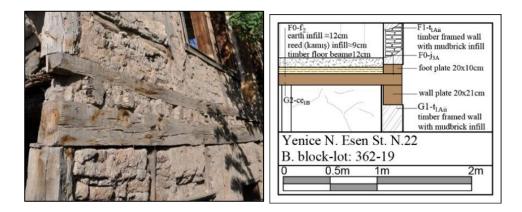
Connection detail 3, section drawing of floor beams located on the wall plate of lower floor wall and foot plate of upper floor wall located on the floor beams (Gedik N. b.block-lot:362-19)
